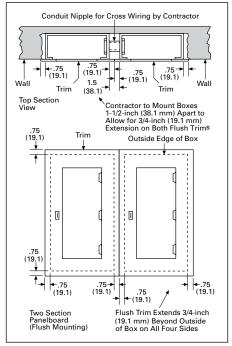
Multiple Section Panelboard— Flush Mounted—Dimensions in Inches (mm)
